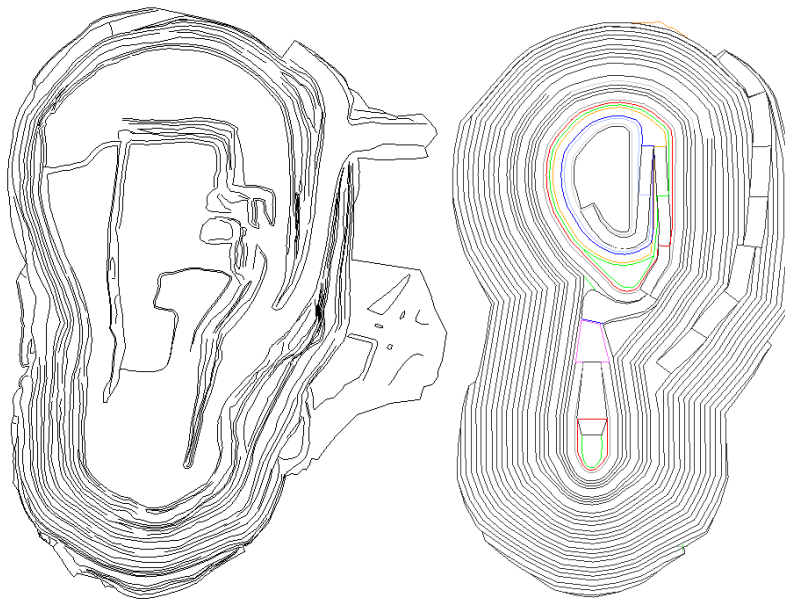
Strings of pit status as at 30 Jun 2013 and Final Pit Design
